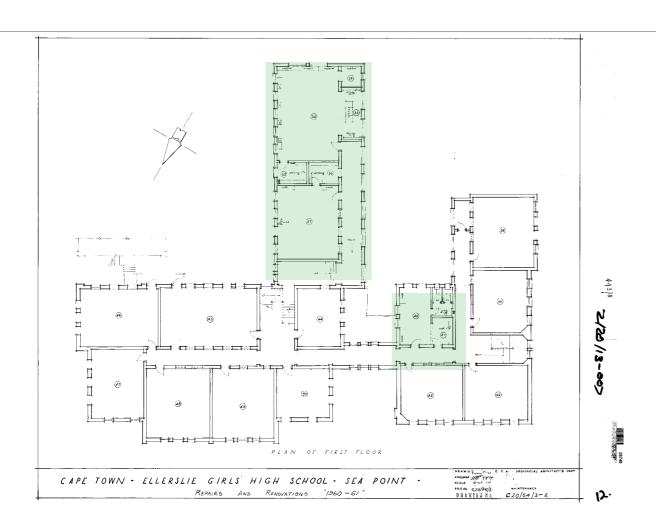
Plans of 1959 additions and alterations, Black and Fagg Architects (WCG Archive, 2023)
